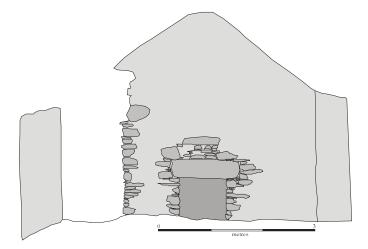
Structure 1, internal elevation of south gable of original build with fireplace
